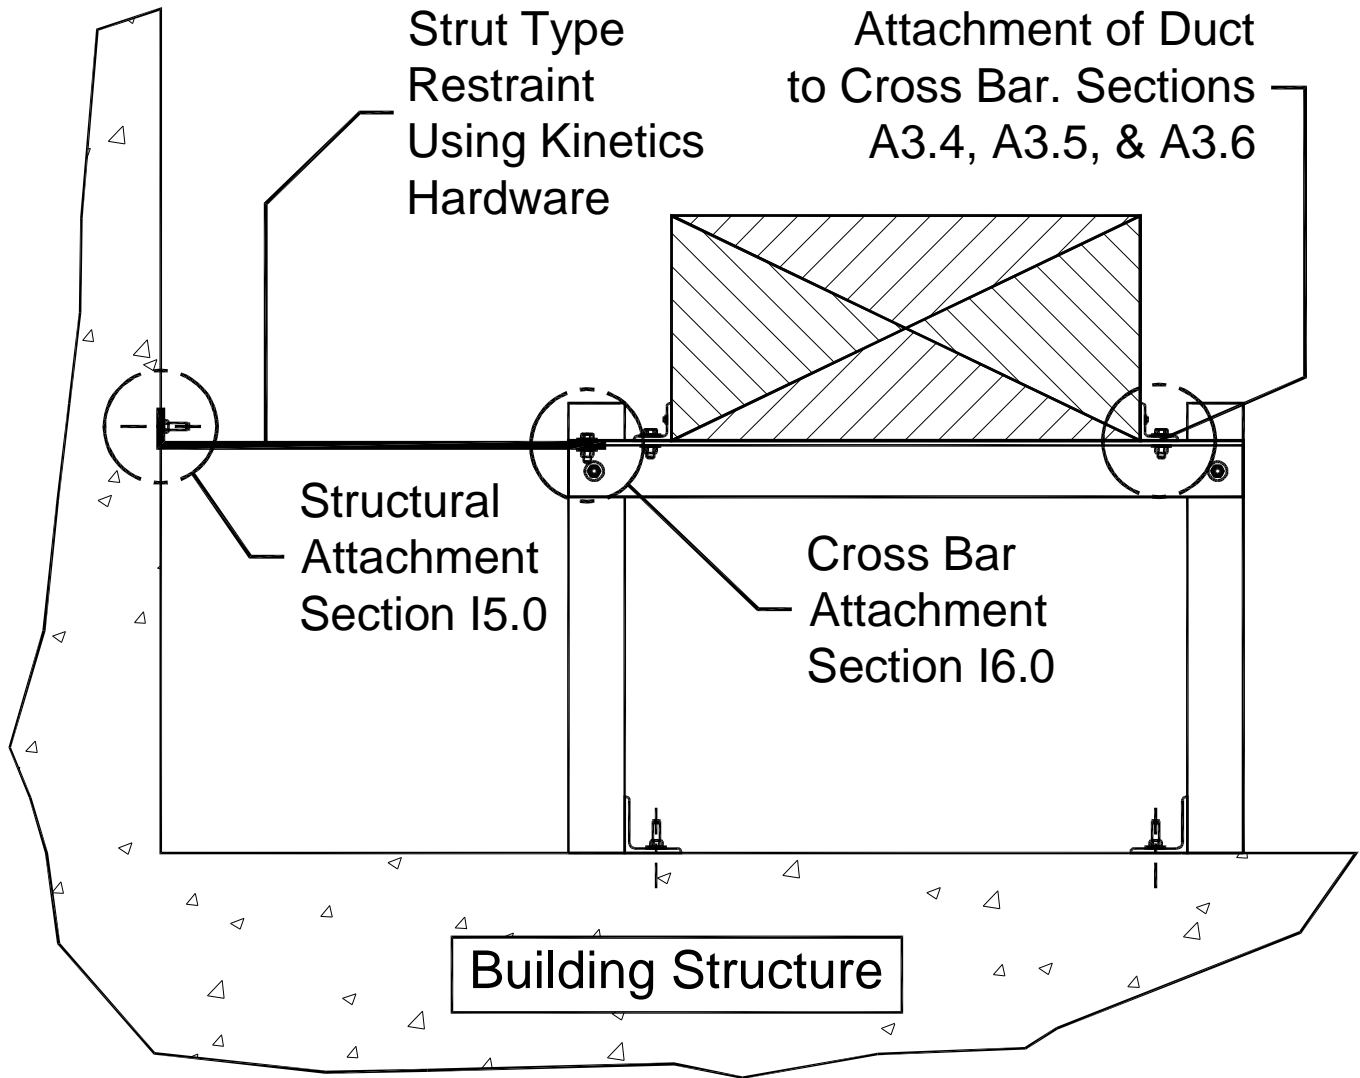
; Transverse (T) Strut Type Restraint Schematic for Floor/Roof Mounted Duct – Horizontal Strut
